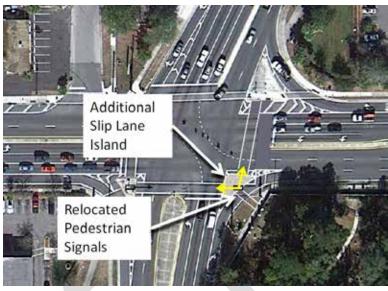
SR 26 and Waldo Road, Modified Southeast Corner
